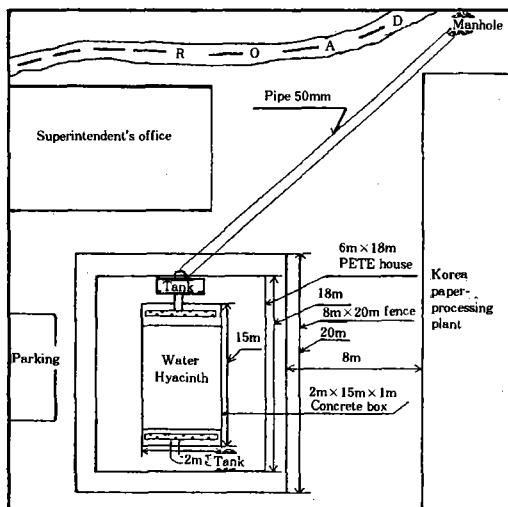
Layout of the pilot plant at Baeksuk Nongkong-Danzi
